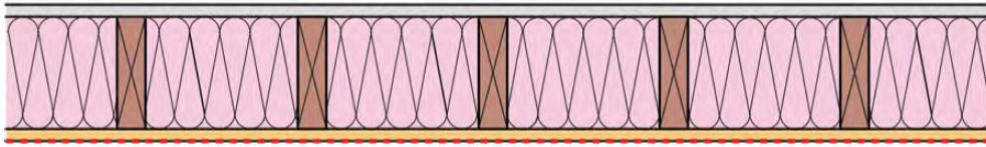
Plan view of wall section for THERM simulation (Straube, 2009)
